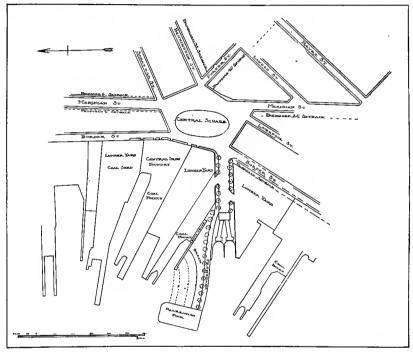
PROPOSED STREET AT CENTRAL SQUARE WITH PUBLIC PIER AT END AND POSSIBLE FERRY CONNECTIONS.
